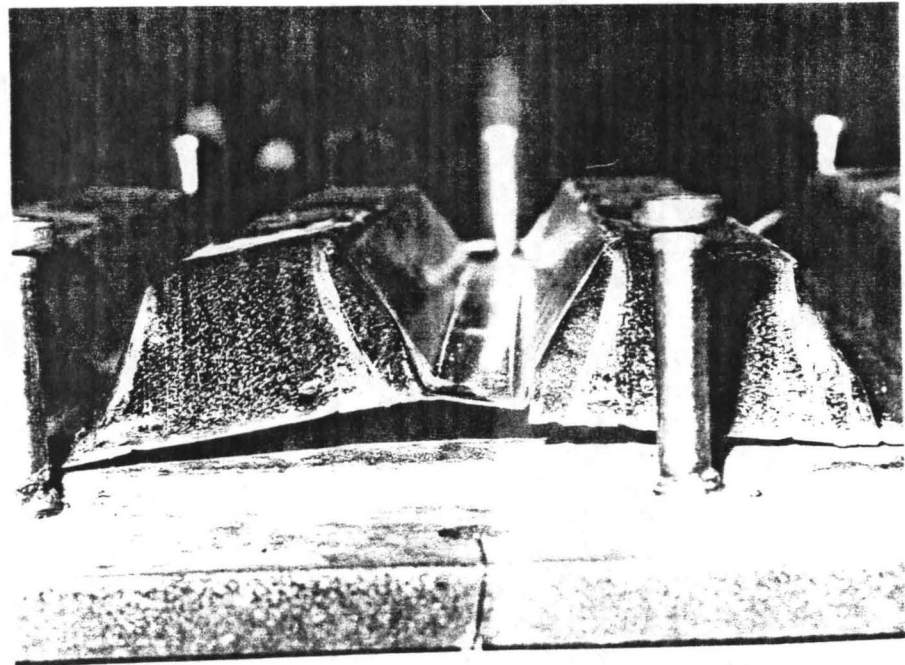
Upward Lifting of Bridgform Between Fasteners Over the Outside Web at a Load of 50 Kips
